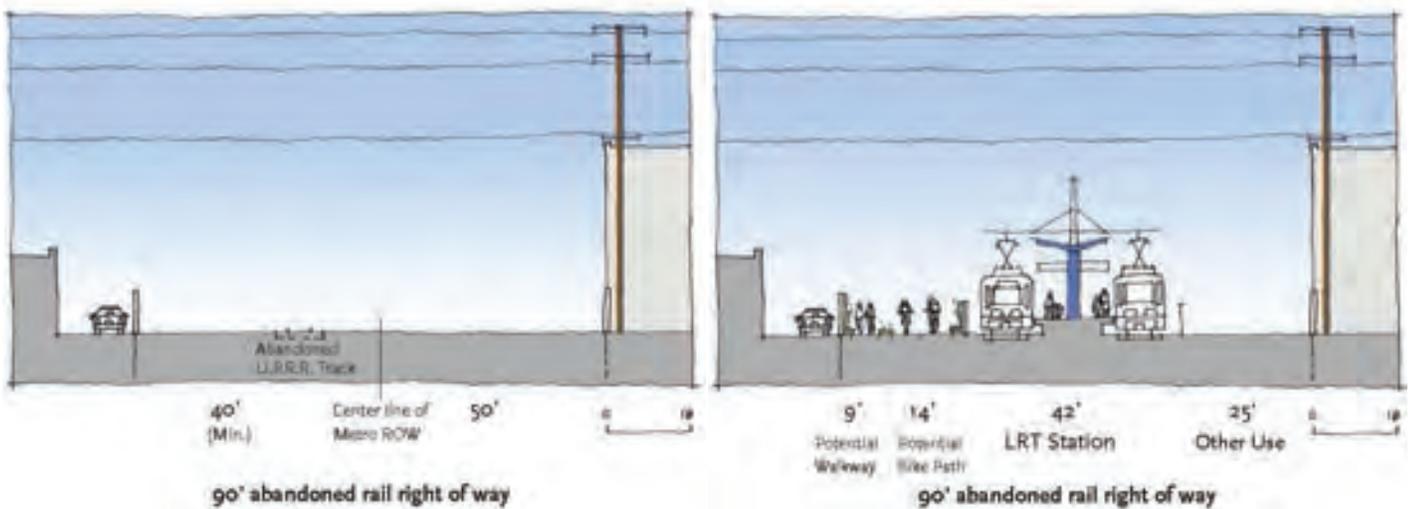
Existing and proposed cross sections of Southern Terminus station (looking southeast towards Pioneer Boulevard)
